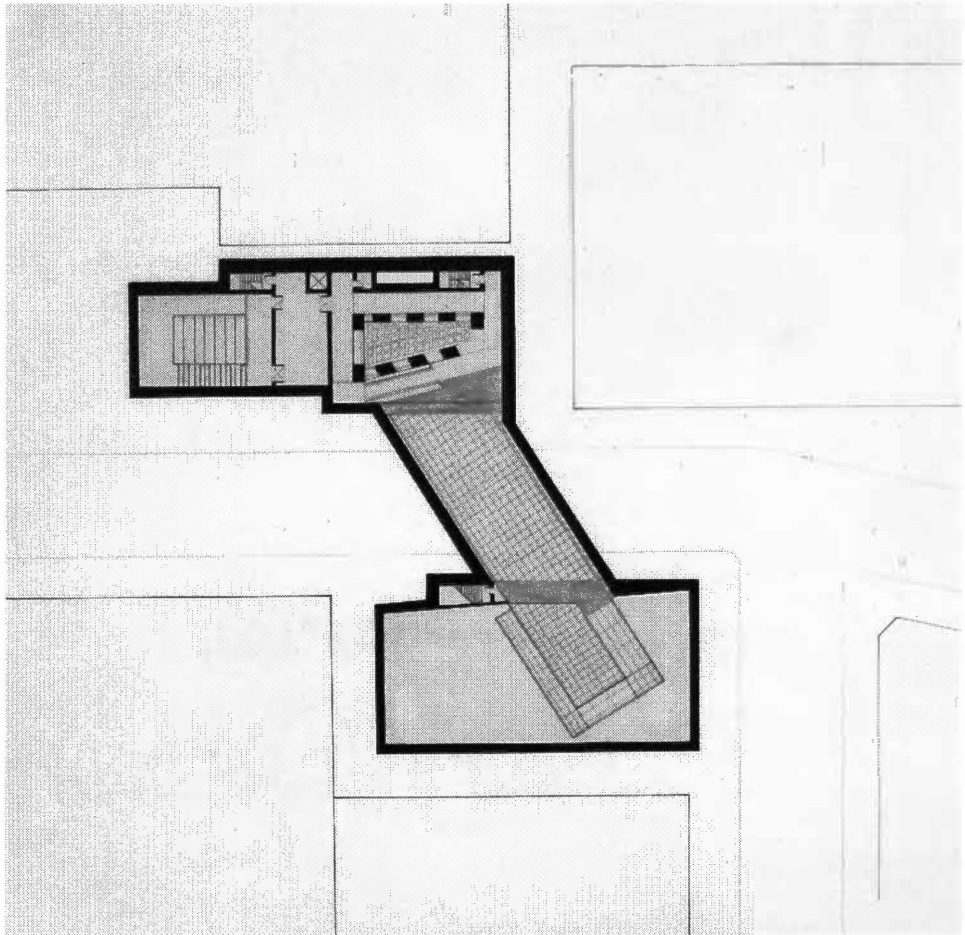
FLOOR PLAN - URBAN PLAZA BELOW GROUND FLOOR
